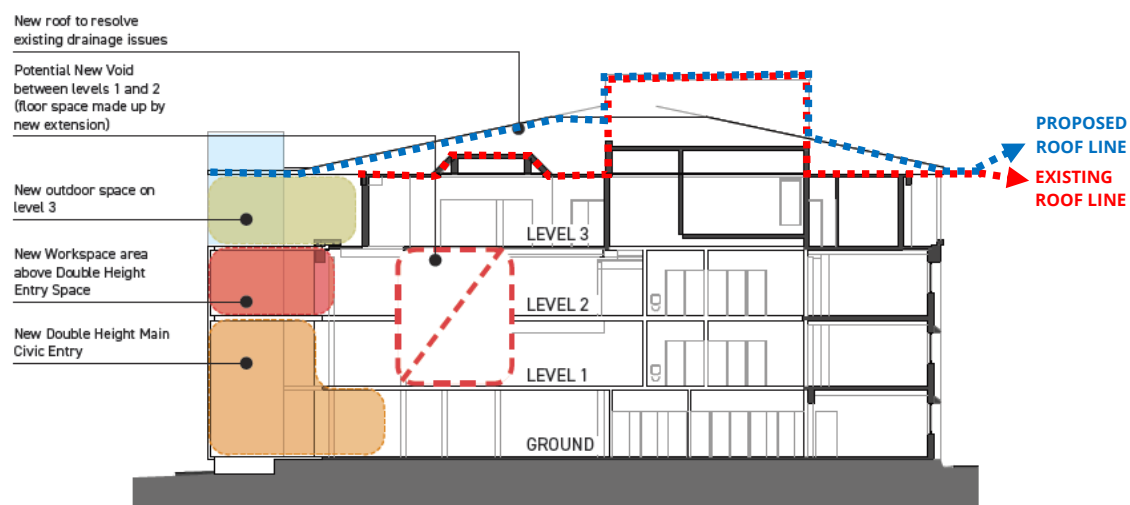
Schematic section showcasing the new roof (blue) proposed to be installed above the existing roof (red). Source: Lahznimmo + Antelope with Curio additions, 2021.
